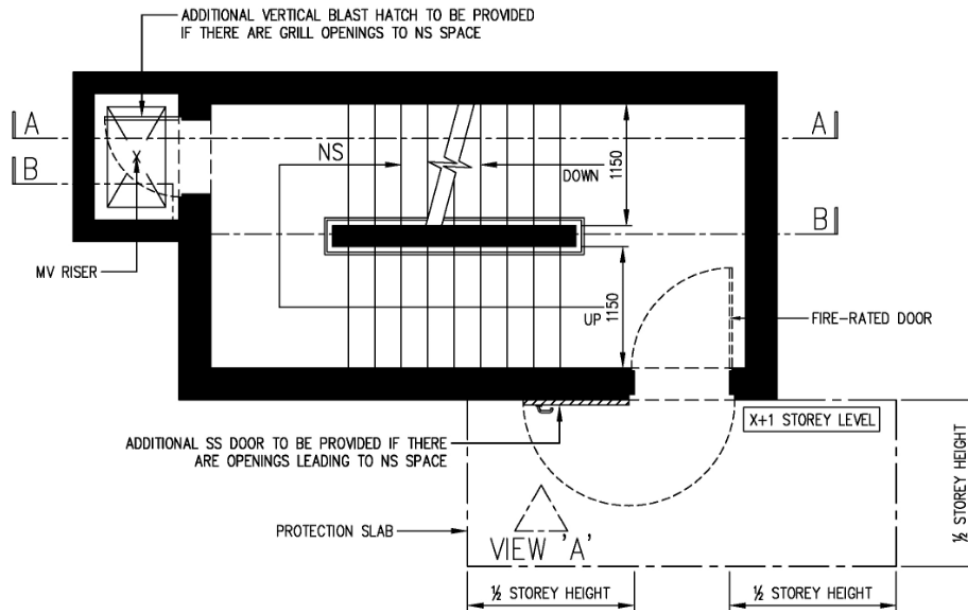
PROTECTION OF RC SHIELDING WALL
